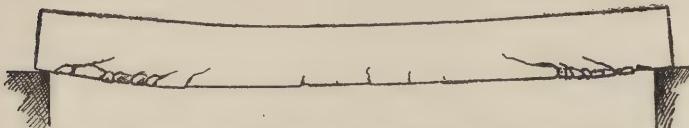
Beam with Horizontal Reinforcing Rods and Loose Stirrups.
